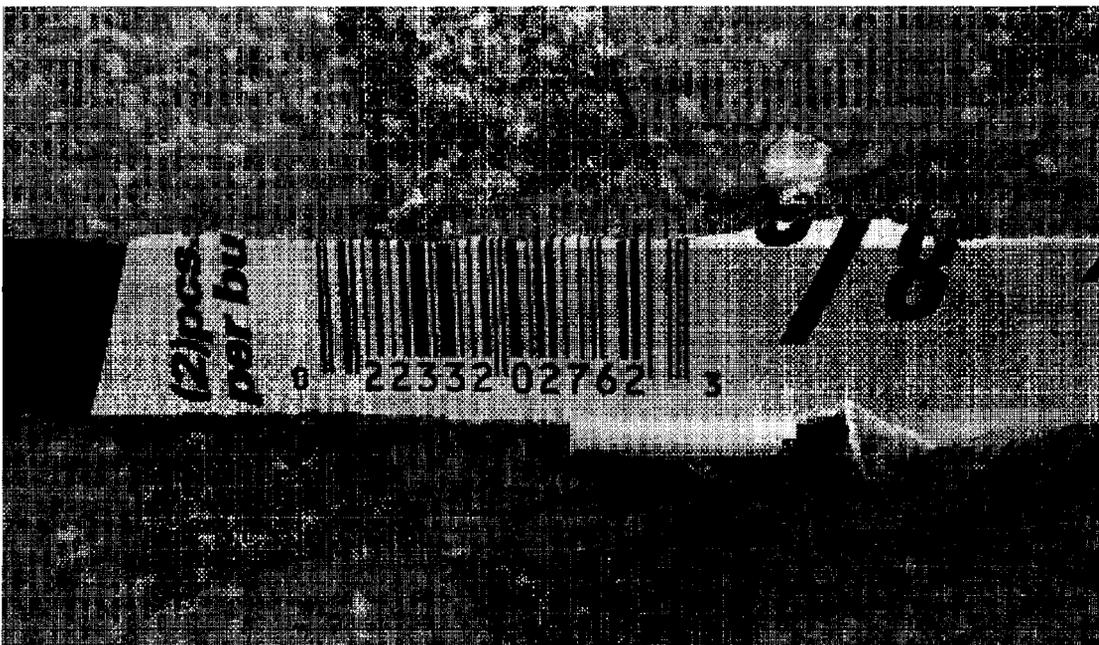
Photograph of the bar code printed on the drywall strips.
